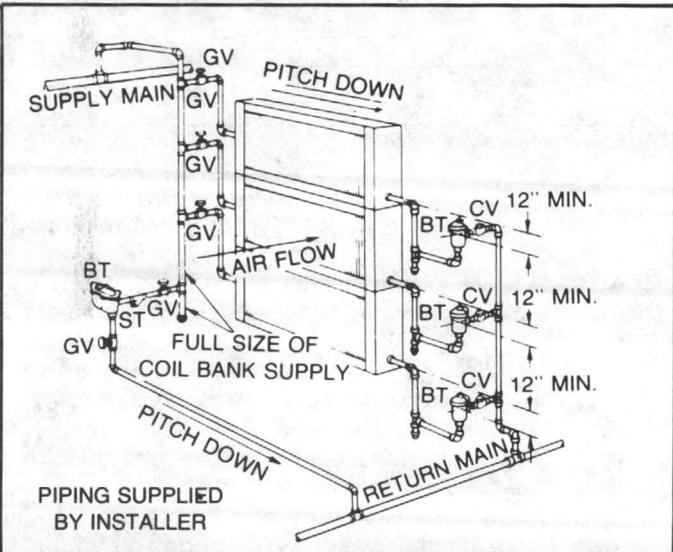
Typical Piping for Type A Steam Coils, High Pressure, Vertical Tubes for Horizontal Airflow
